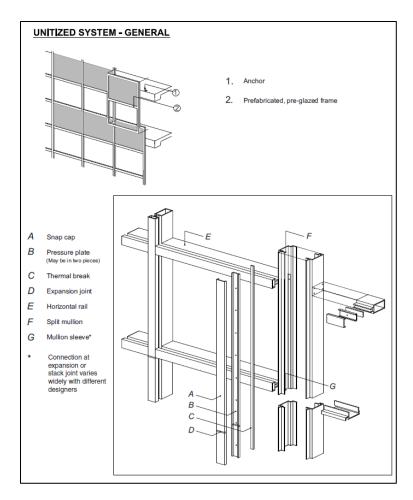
Unitized Curtain Wall Systems configuration and installation (source: CMHC Guide, 2004)
